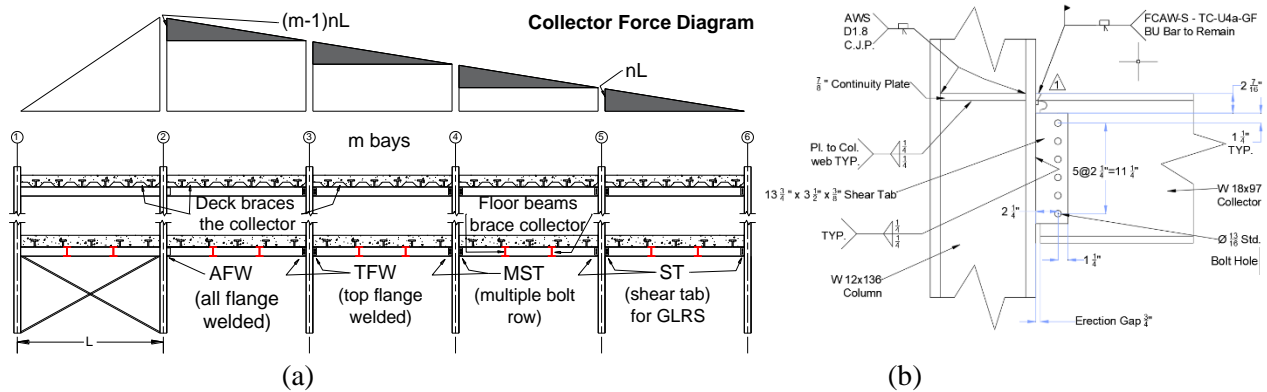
Steel Seismic Collectors: (a) Collector Line and Forces; (b) Typical Collector Connection.
